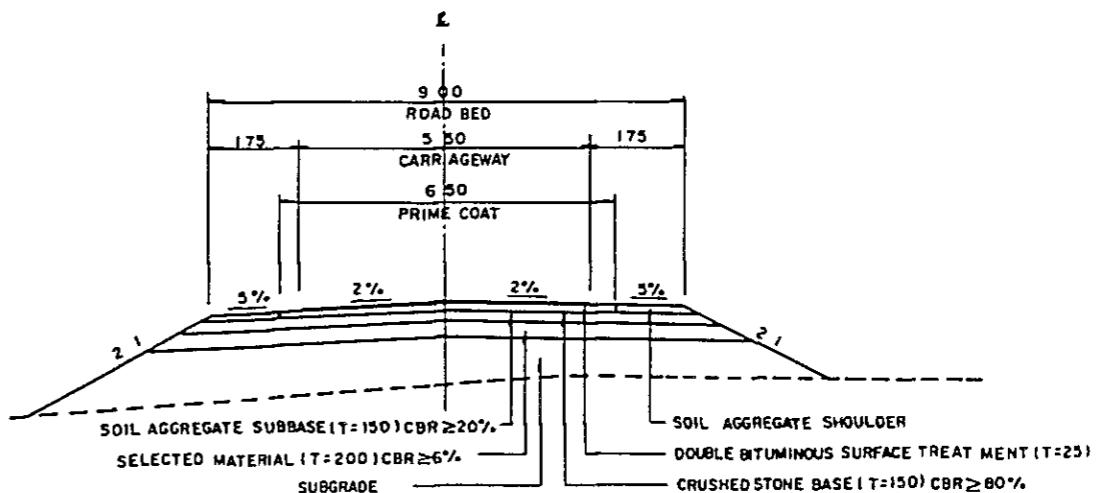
TYPICAL CROSS SECTION AND TYPICAL PAVEMENT STRUCTURE
